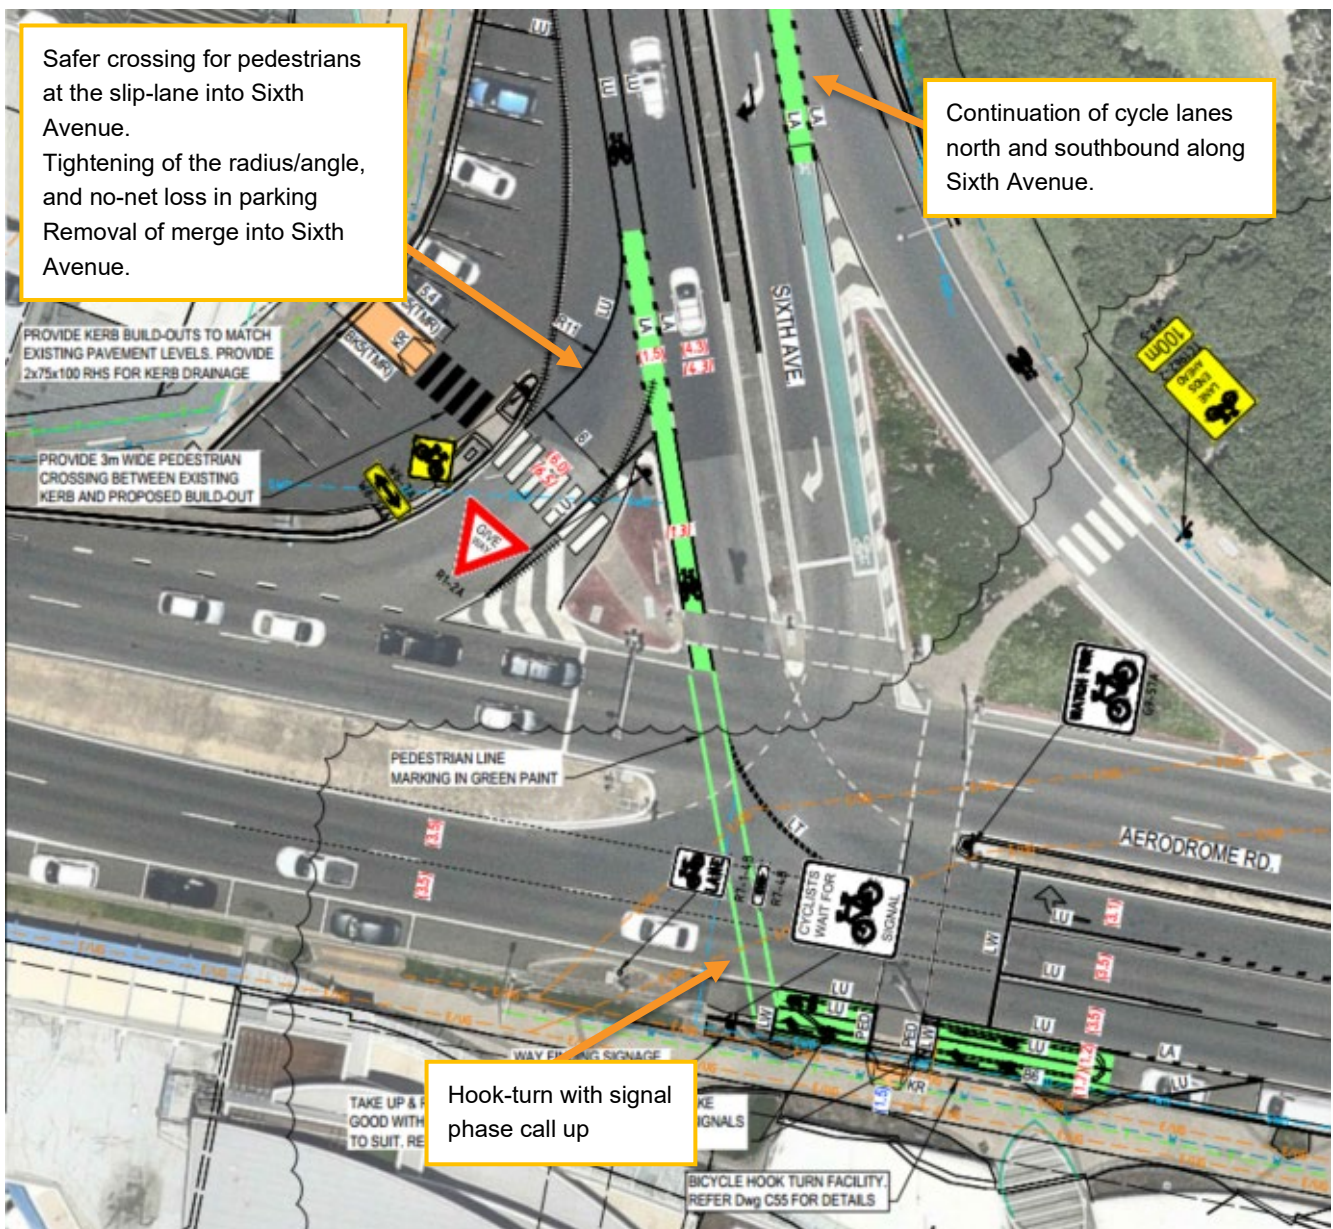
Aerodrome Road/Sixth Avenue intersection concept design proposal
